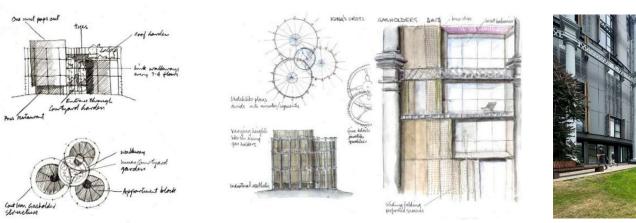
Coal Drop Plaza Elevation and Existing Conditions
